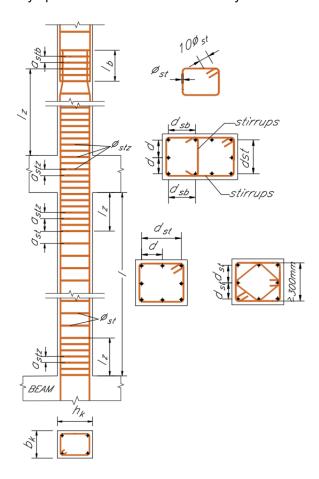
Rules for detailing of reinforced concrete columns according to KTP-N.2-89 (source: Enes Veliu, based on KTP N.2 89).
